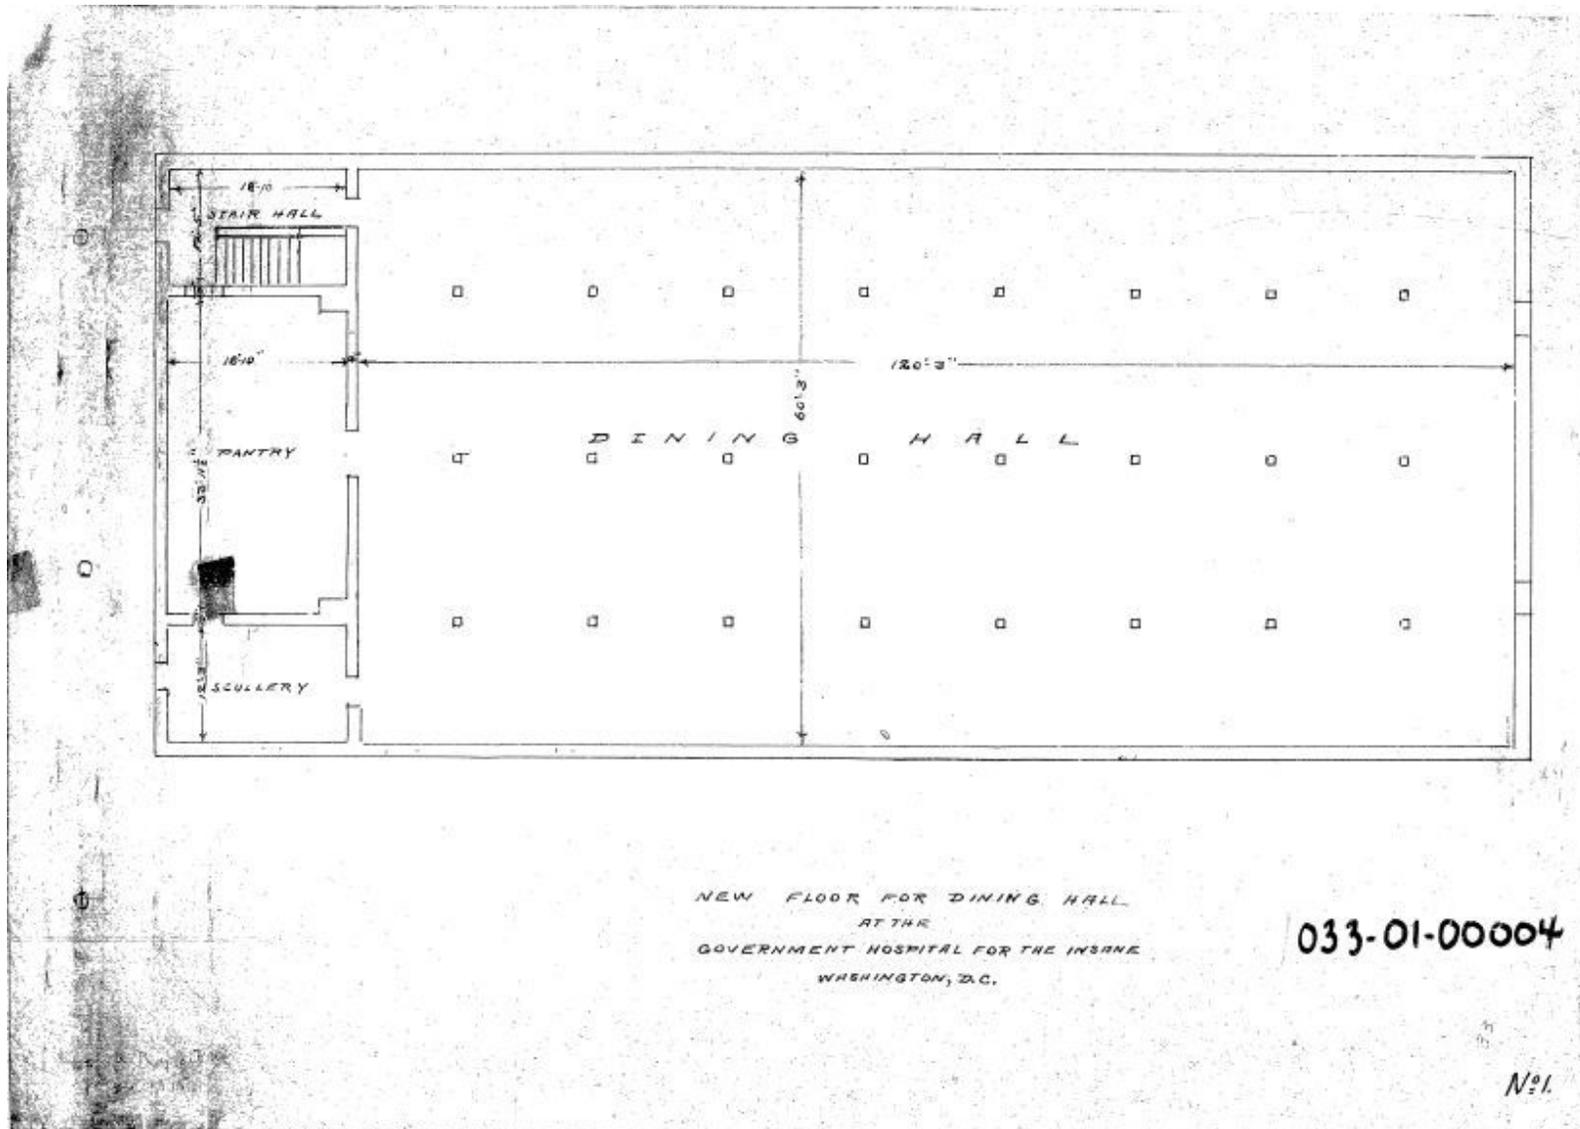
1915 construction documents showing alterations to Dining Hall. Source: GSA archives, image DC1452SE0102.
